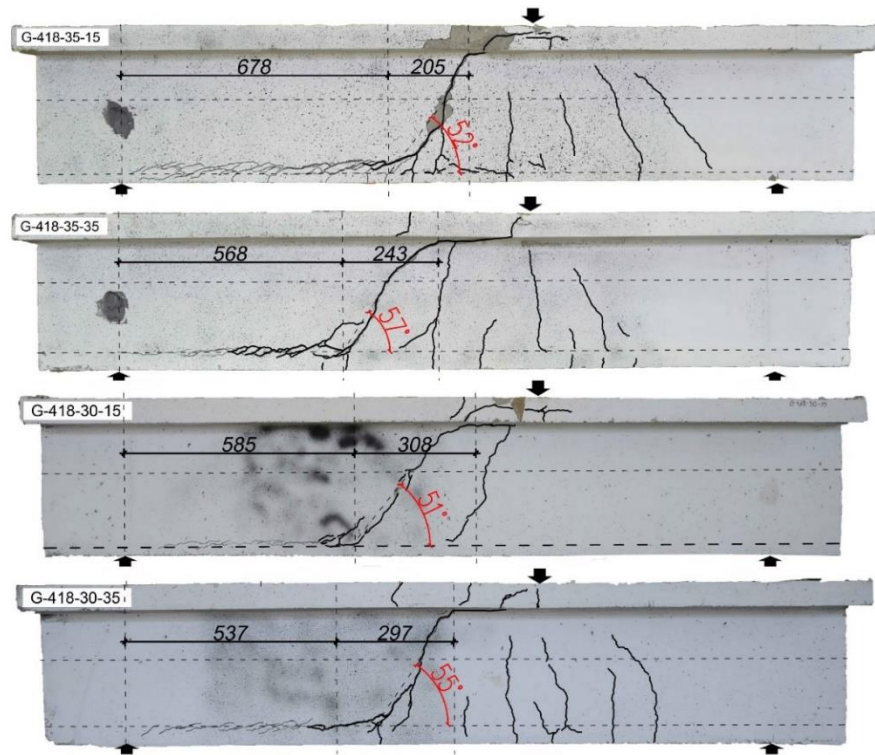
The crack pattern beams with reinforcement ratio ~1%.
